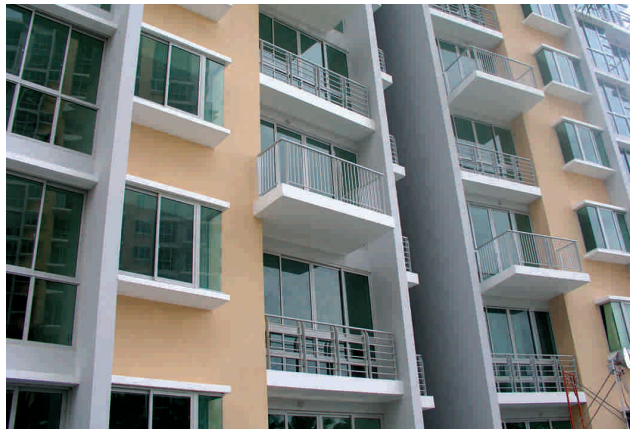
Precast balcony and planter box at alternate floor level
